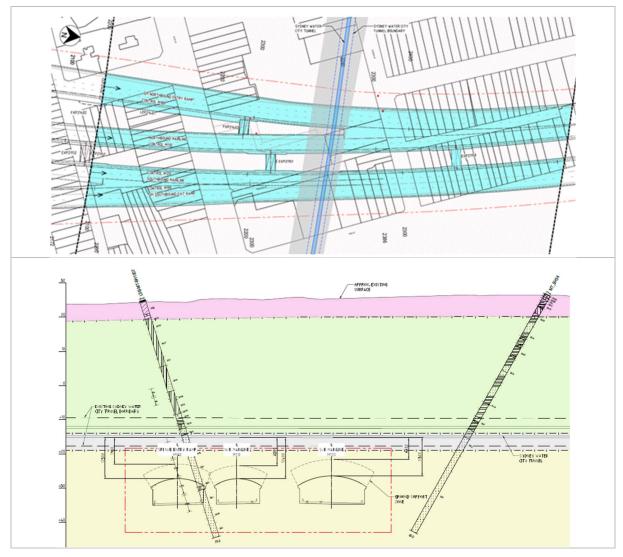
Plan and Section of M4-M5 Link Tunnels and City Tunnel
